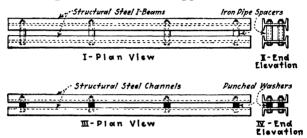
Assembled stringers composed of steel channels or I-beams.
